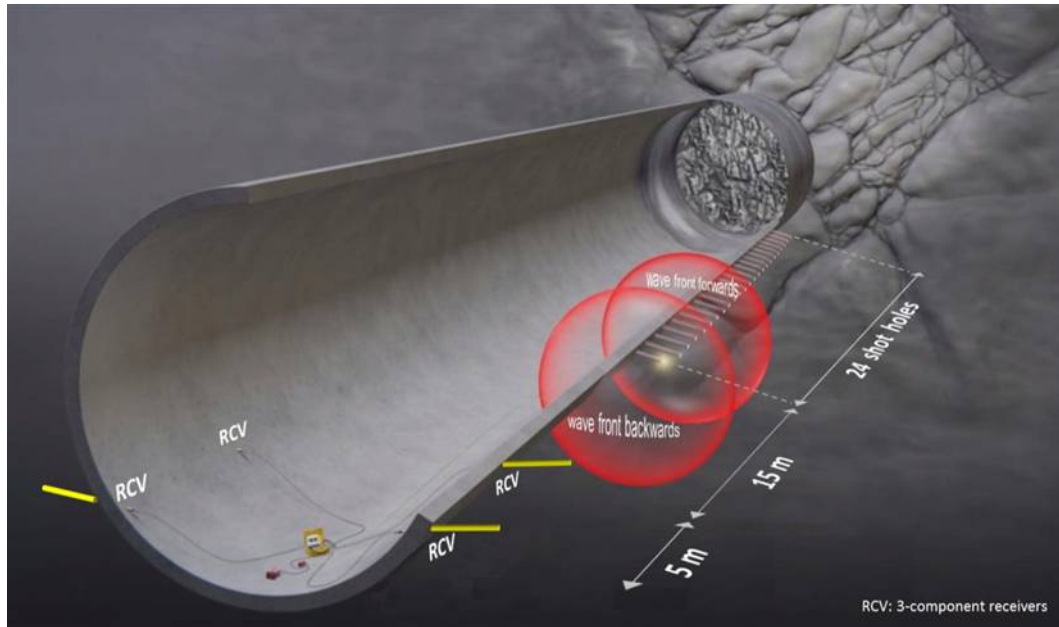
Standard TSP measuring layout. 24 explosive charges are being shot one by one along right or/and left tunnel wall close to the tunnel face. Four receivers arranged further back pick up arriving waves.
